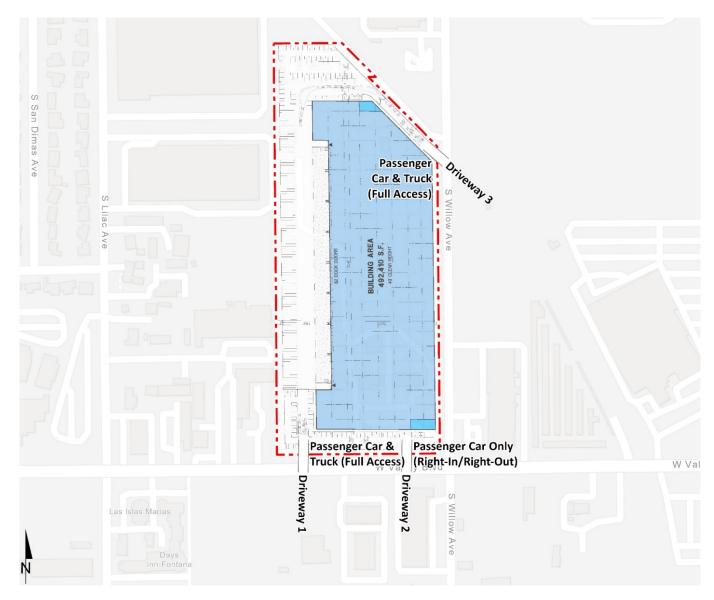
PRELIMINARY SITE PLAN
